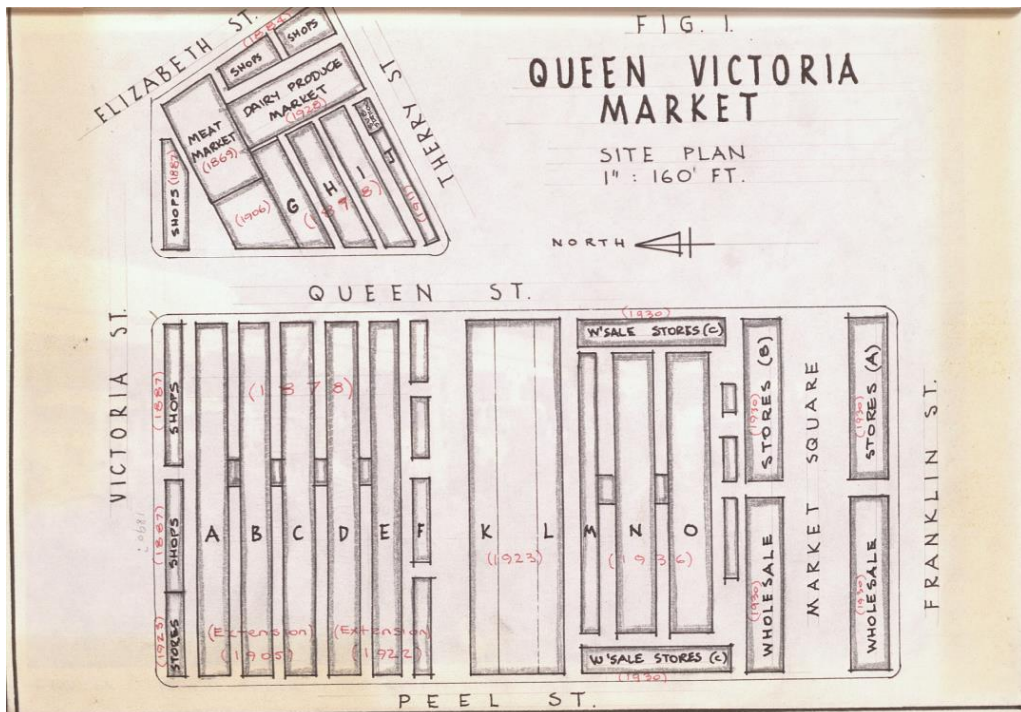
Site plan of Queen Victoria Market with shed names (with construction dates in brackets) in 1968
